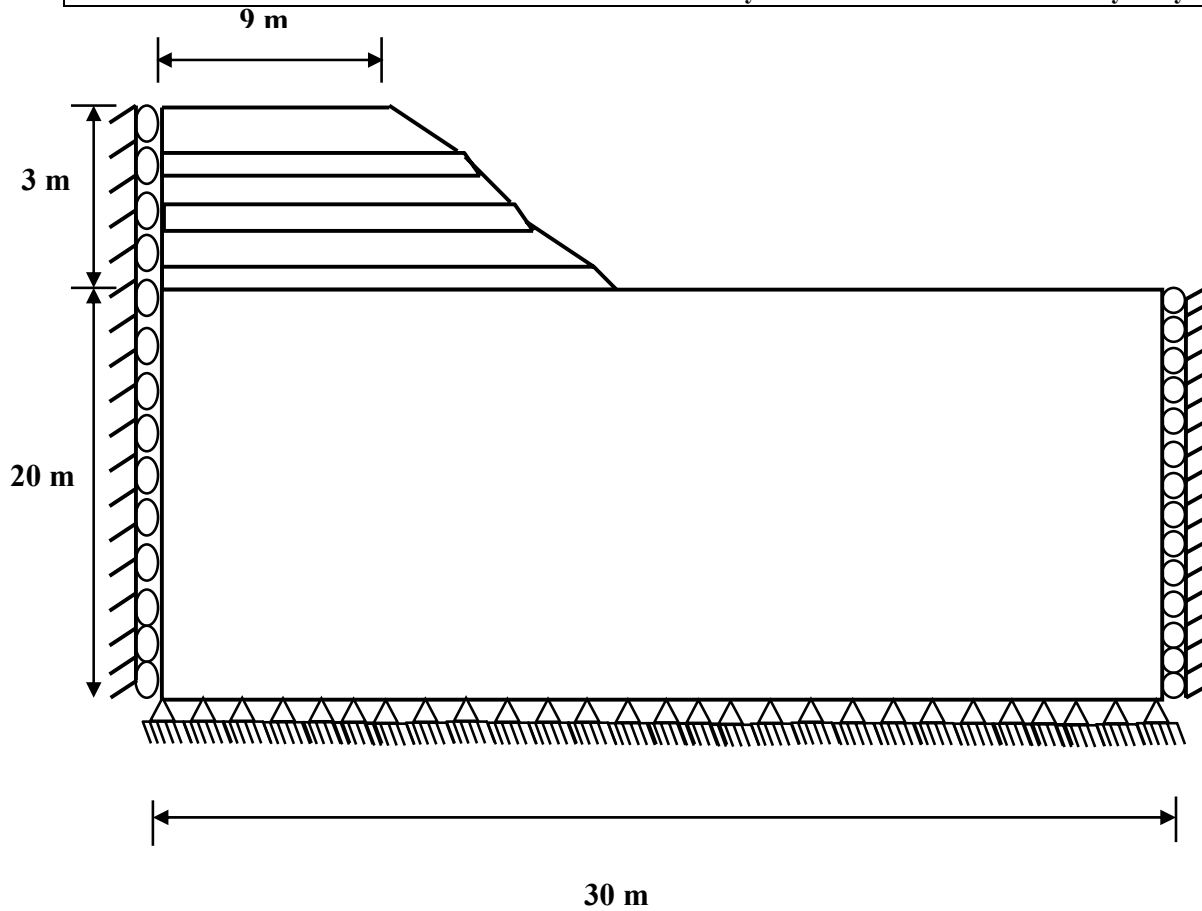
The Cross Section of Embankment Foundation System with Geotextiles Reinforcement.
